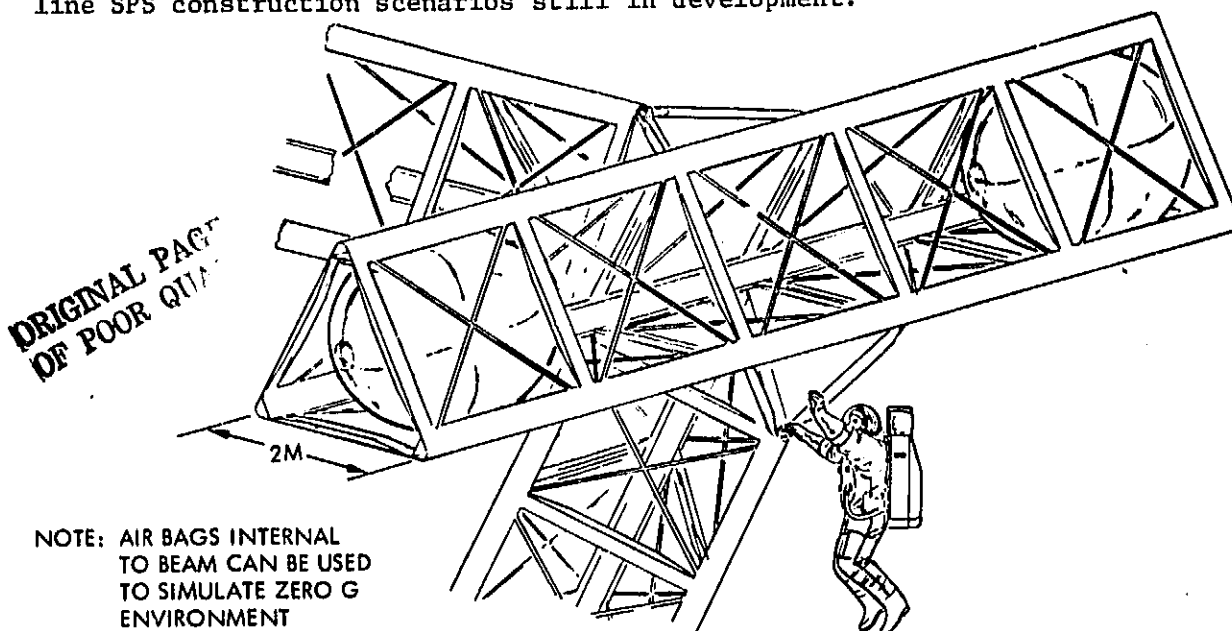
Neutral Buoyancy Tank Joint Test Specimen
